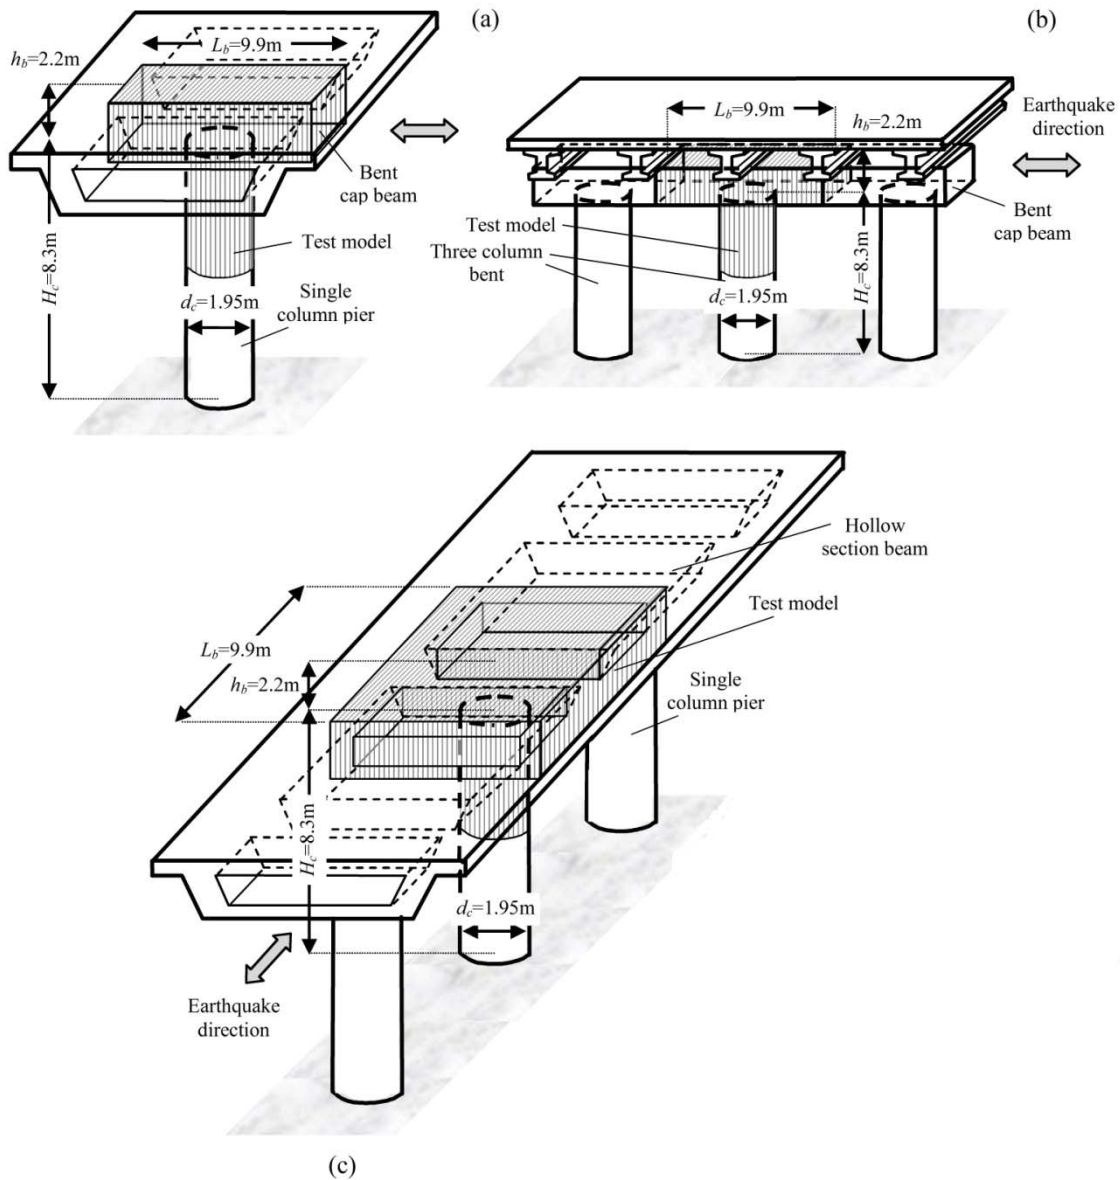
Representation of the prototype bridge structure commonly encountered in Egnatia Avenue and the test model for: (a-b) A1 to A4 specimens and (c) A5 and A6 specimens [1].
